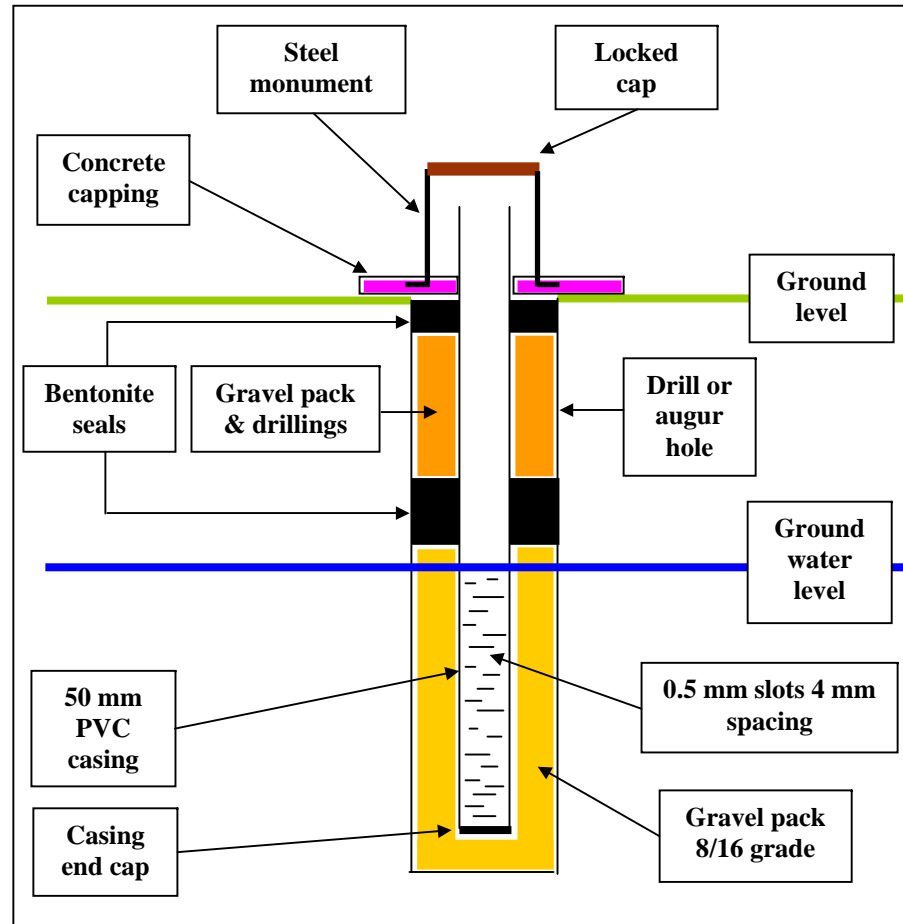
Schematic diagram showing typical design of installed groundwater monitoring bores
